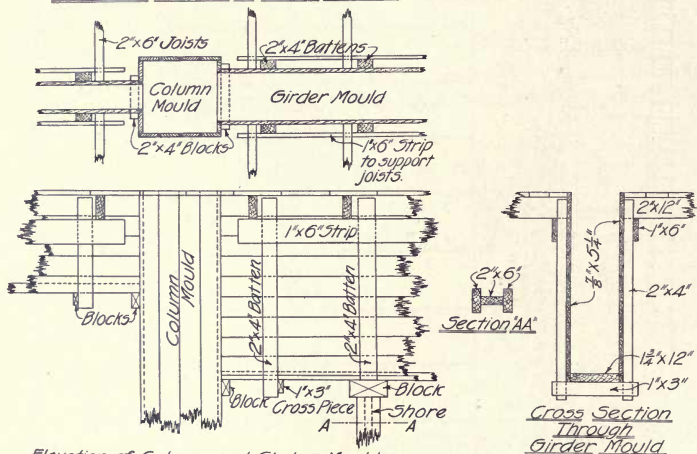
Sectional Plan and Elevation of Girder Molds. (See p. 100.)
